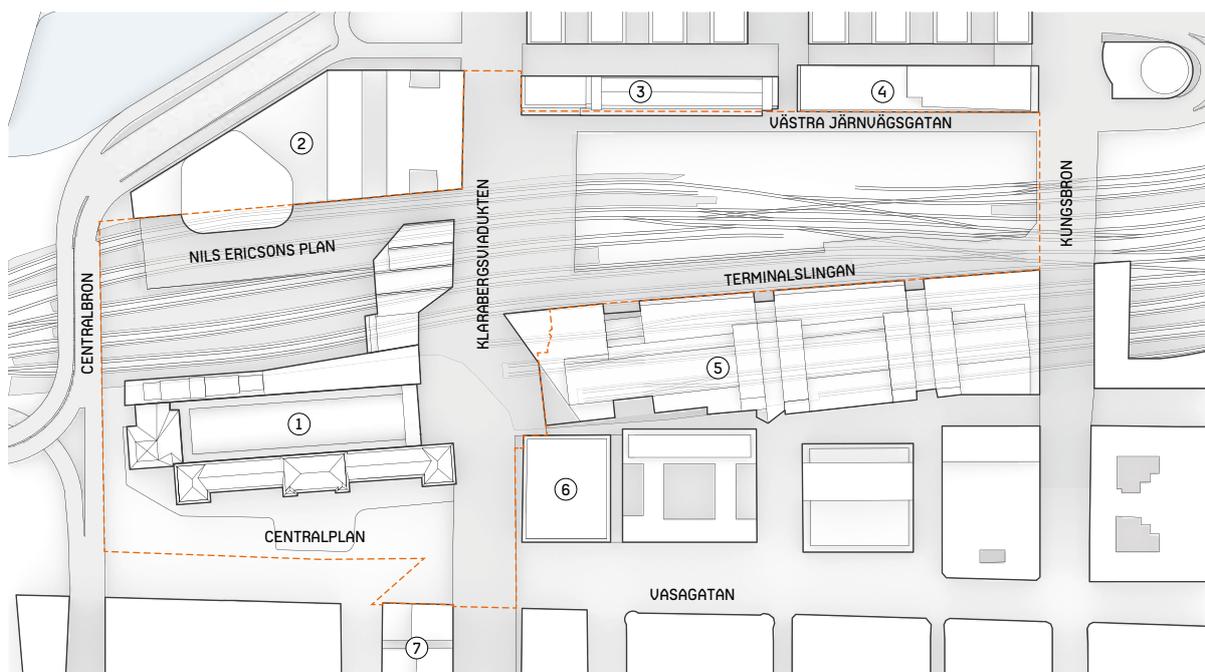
Public space and streets within the zoning plan area (orange outlines). 1. Stockholm Central Station 2. Waterfront Congress Centre 3. Klarabergshuset 4. Kungsbrohuset 5. Cityterminalen & World Trade Center 6. Radisson Blu Royal Viking Hotel 7. Scandic Continental
